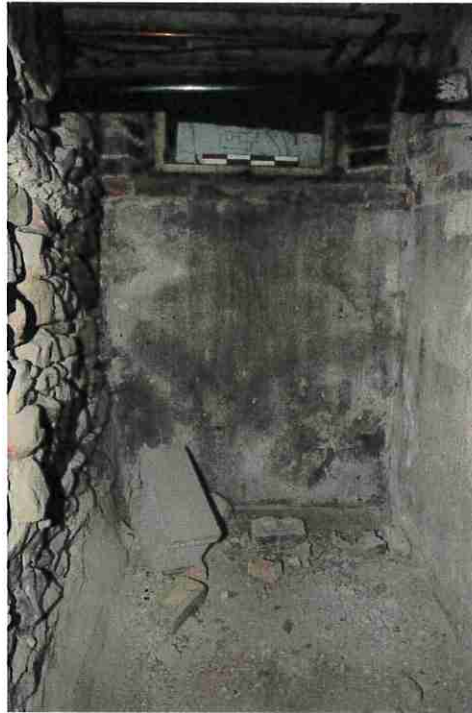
Rubble foundation of the original main block (left) and concrete and brick foundation of the extension as seen from the basement.
